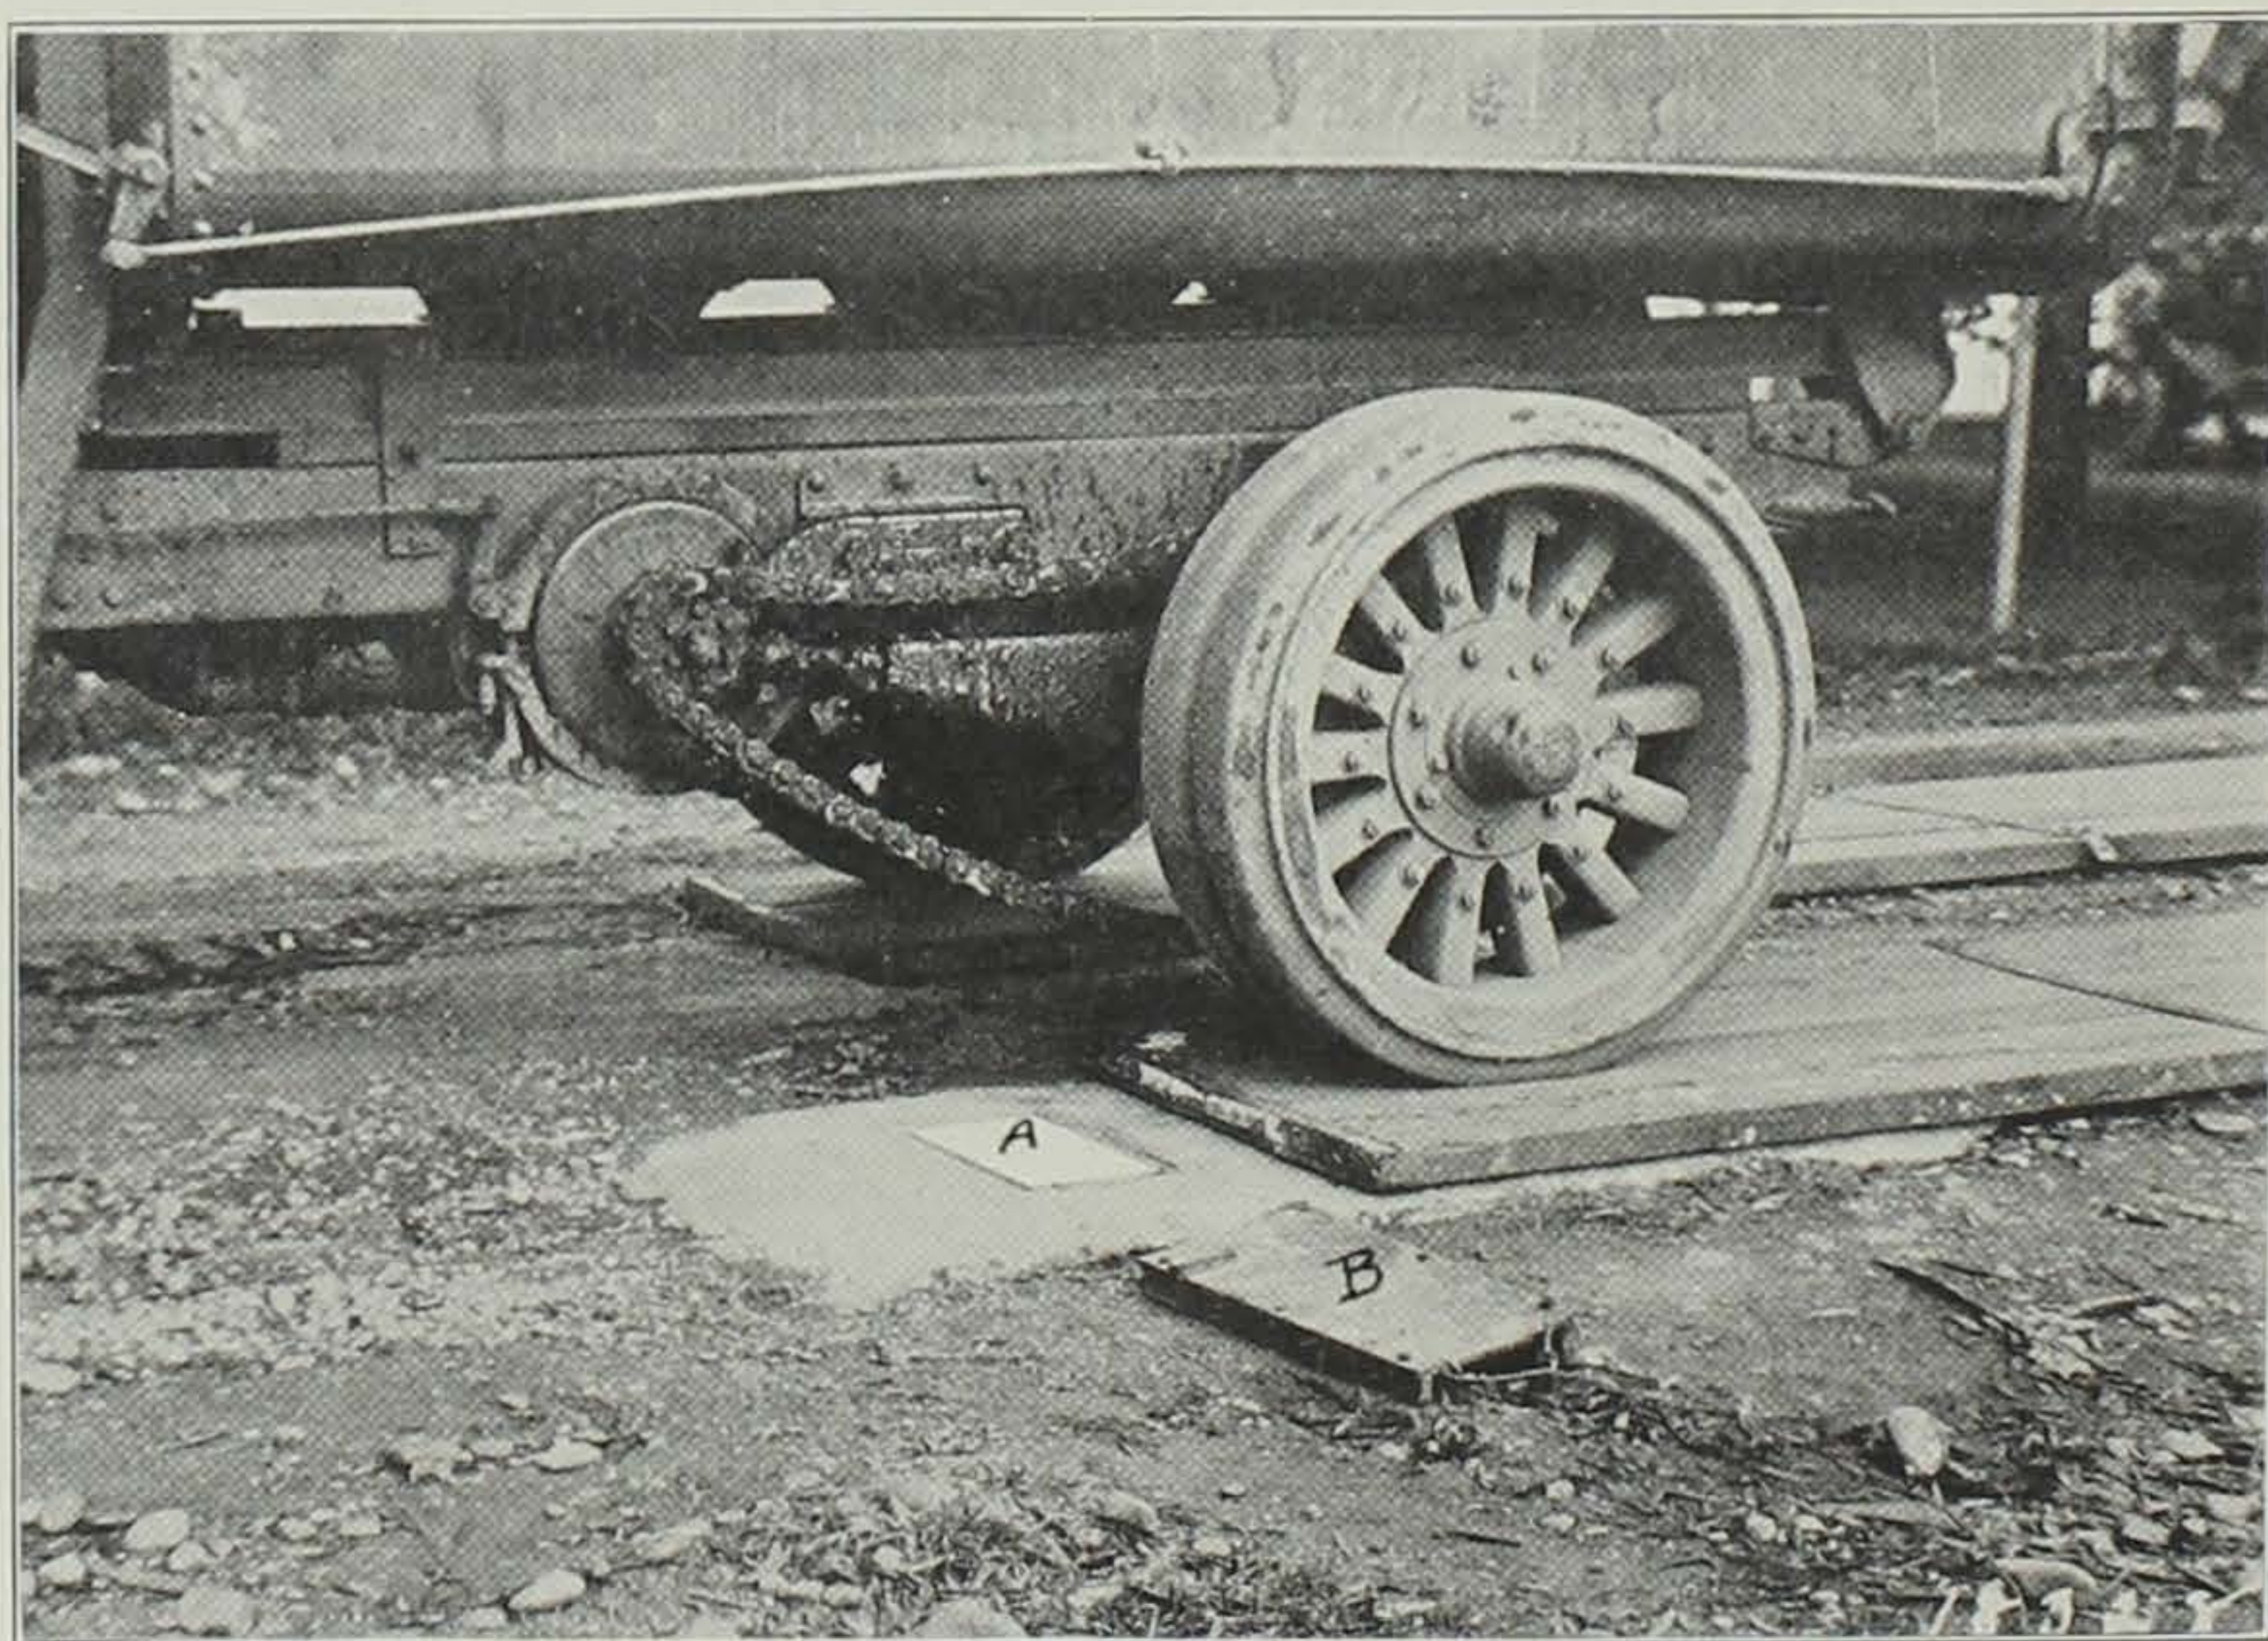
MEASURING IMPACT OF REAR MOTOR TRUCK WHEELS
